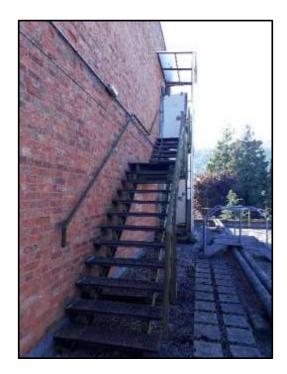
H Building, external metal stair leading to the second-floor area of the former bunker
